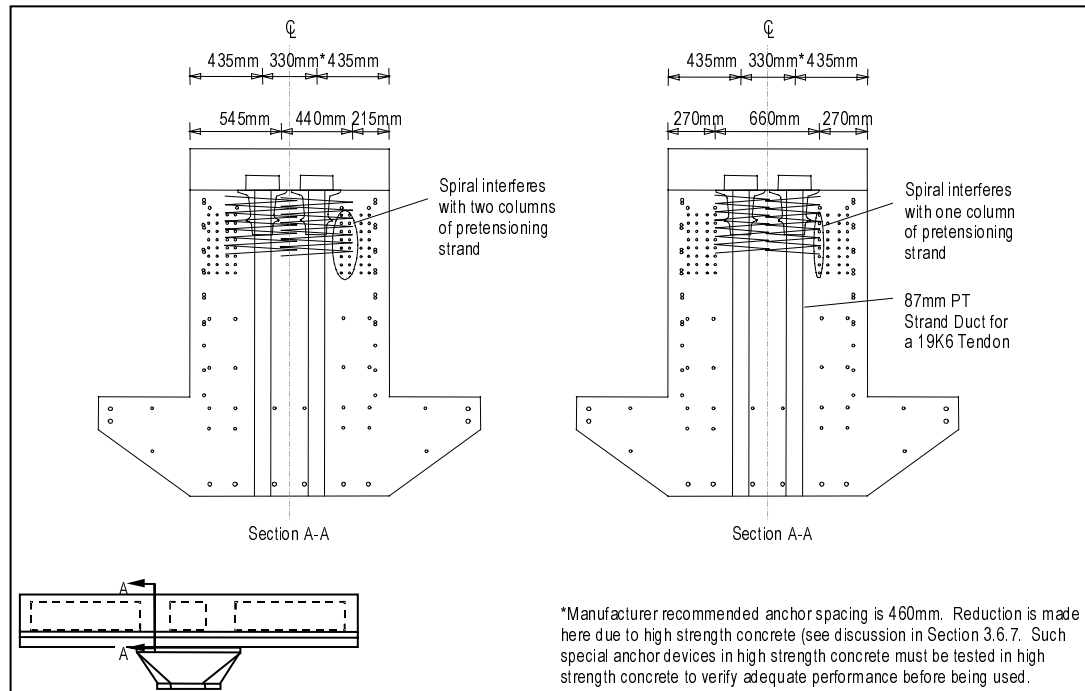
Cross-section through cap at the column post-tensioning strand anchor zone with different size spirals
